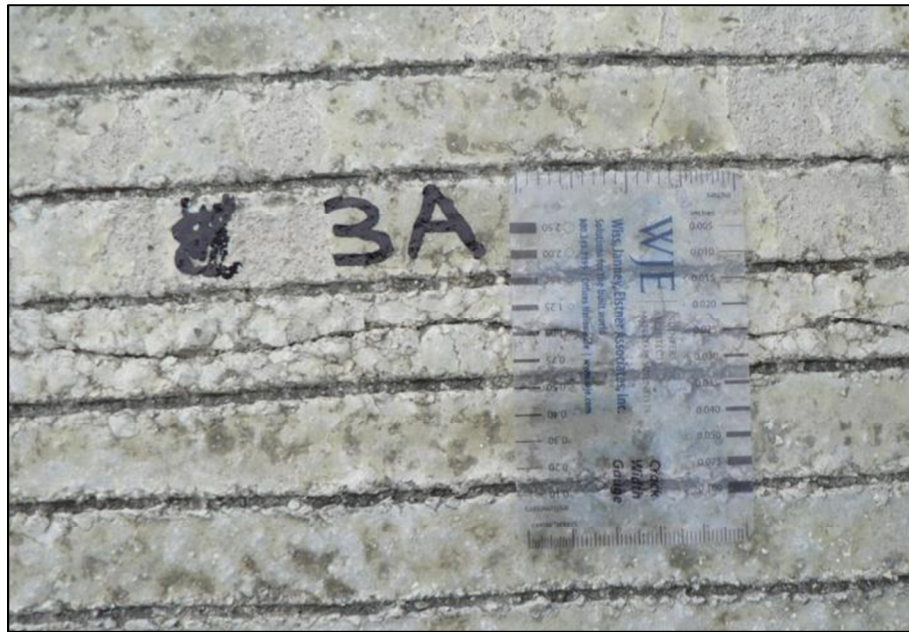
Crack-like lines on San Antonio bridge deck.
